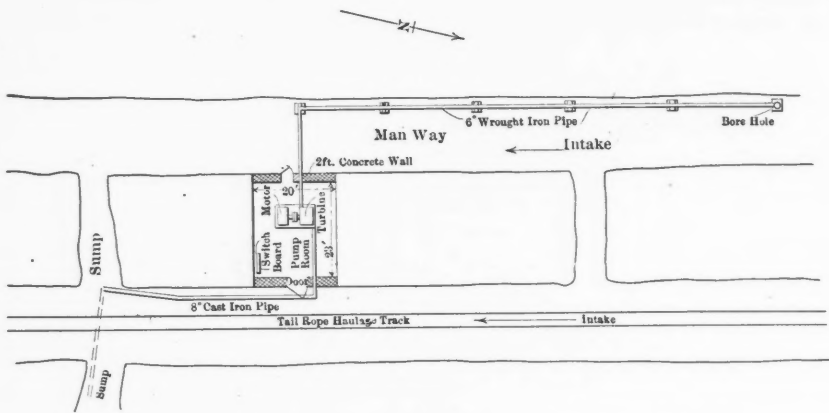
PLAN SHOWING GENERAL ARRANGEMENT OF PUMP ROOM
